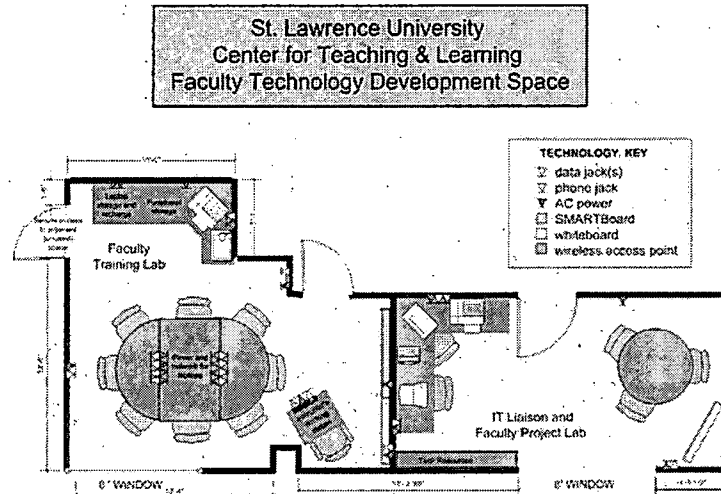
Sample Floor Plan of Training Lab/Conference Room and Faculty Project Lab
